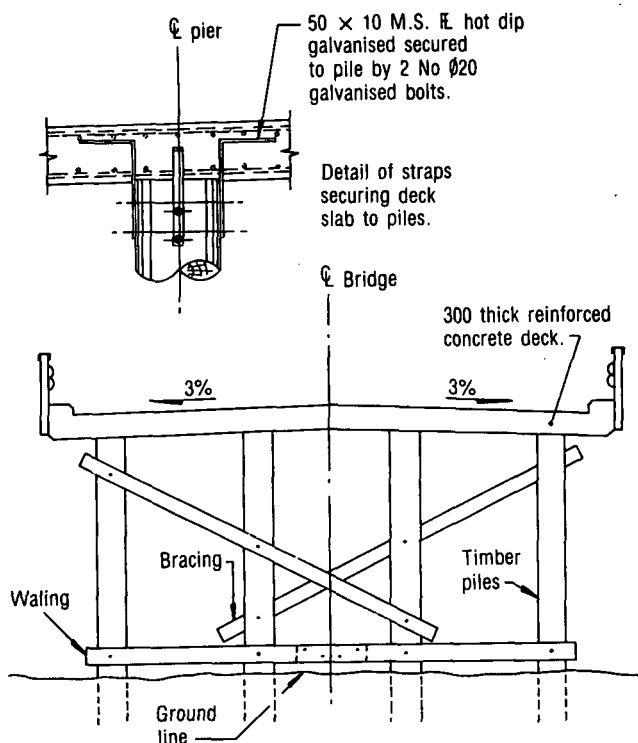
CONCRETE DECK ON TIMBER PILES
